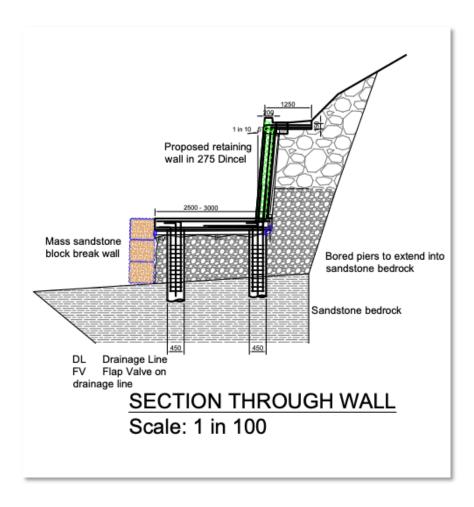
Section of proposed retaining wall (SOURCE: Plan by Peter Blacker and Associates)
